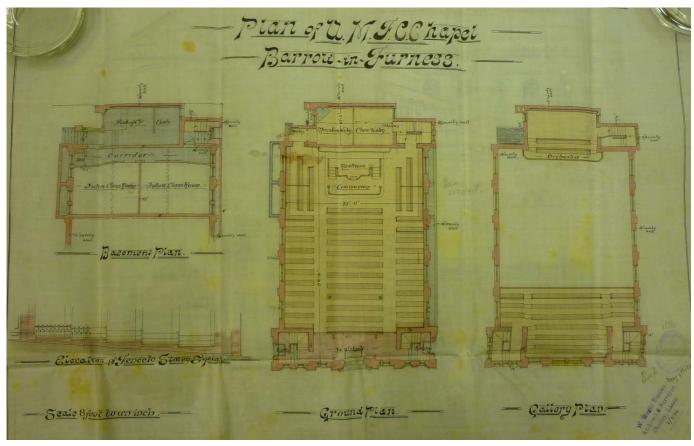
Proposed floor plans (CRO(B) Building Control 3237 1894)
